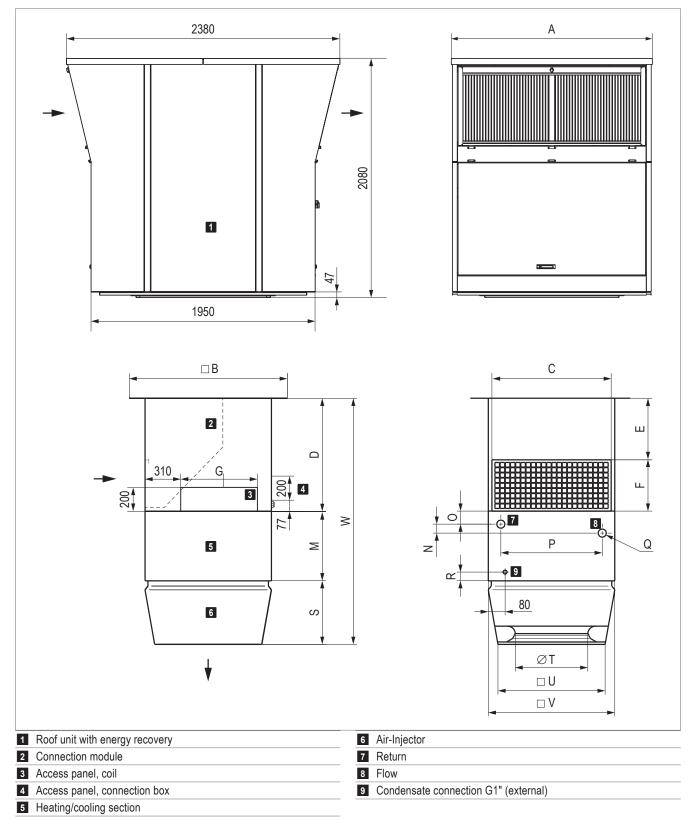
RoofVent® RC dimensional drawing (dimensions in mm)
